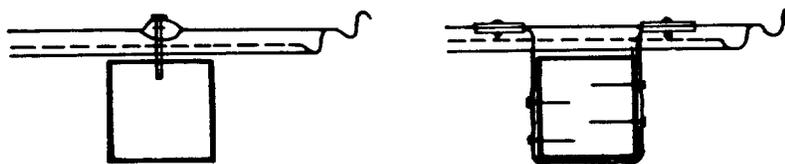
Details of corrugated roof fastening to purlins through top of corrugation
